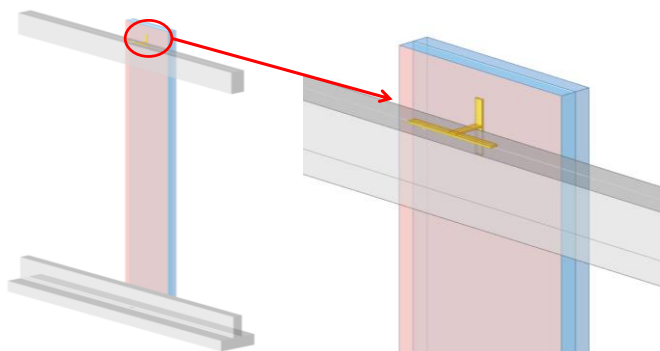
Scheme of a connection between a vertical panel and perimetral beam
